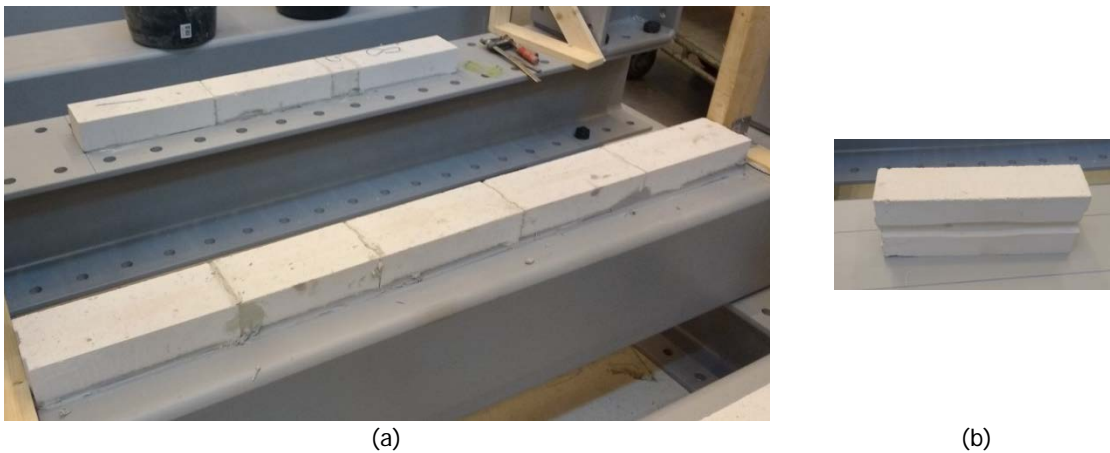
(a) Gluing of first course of masonry; (b) Small units used for the kicker layer in CS element masonry walls.
